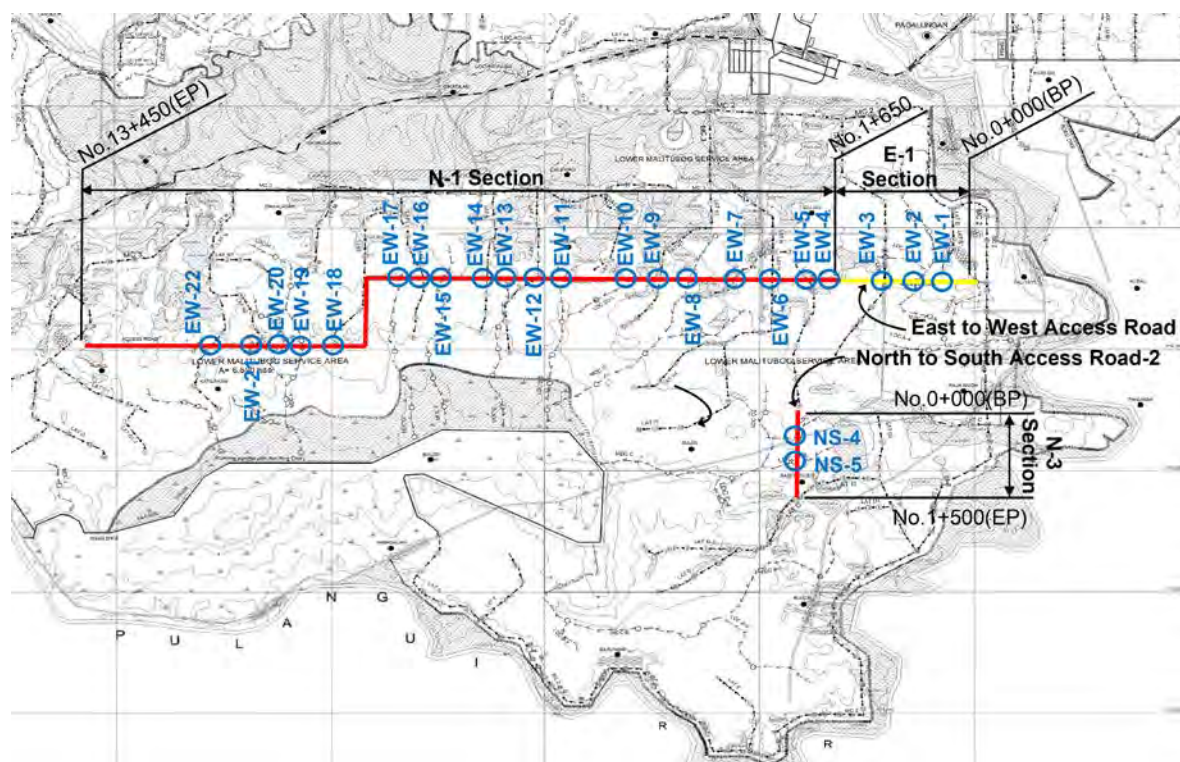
Location Map of Access roads and Bridges (Construction Plan of Case-1)
